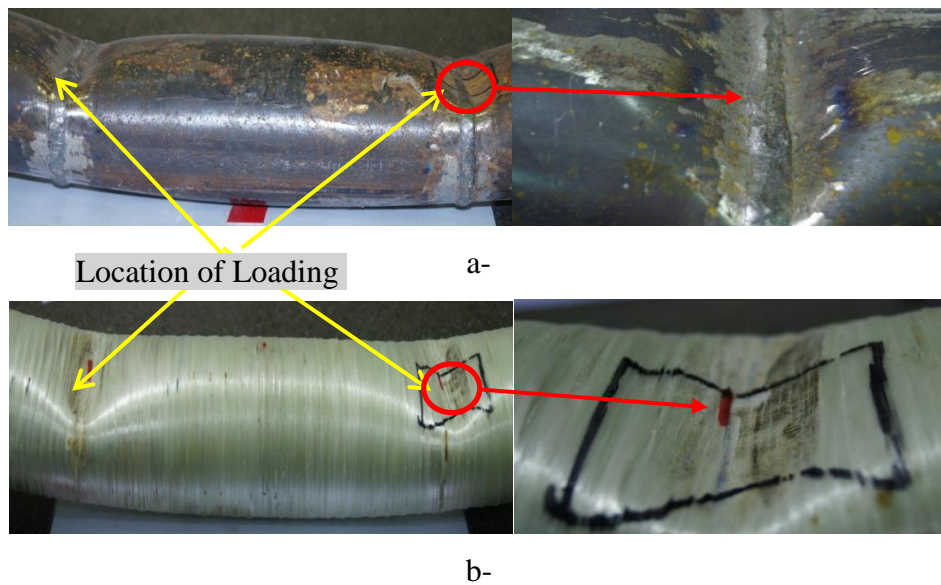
Four-point bending post-failure images; a- steel pipes with two welding lines, b- wrapped with the composite layer.
